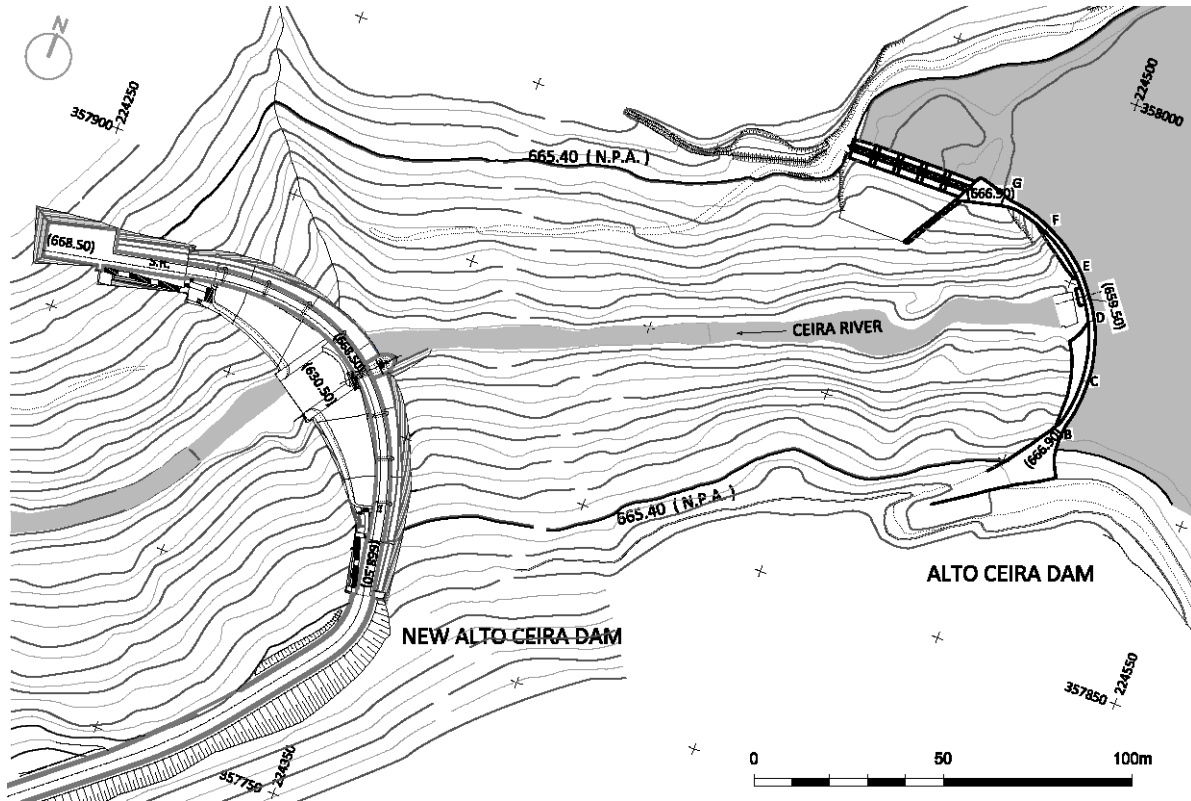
The new Alto Ceira dam (left) and the upstream existing one (right)
